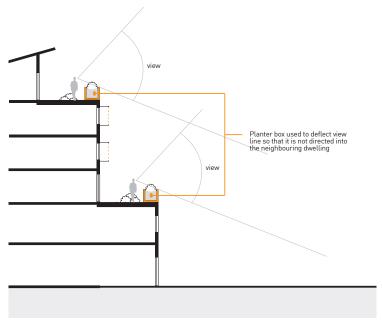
A.10-2: Incorporation of planter boxes into walls or balustrades of podiums and terraces.
